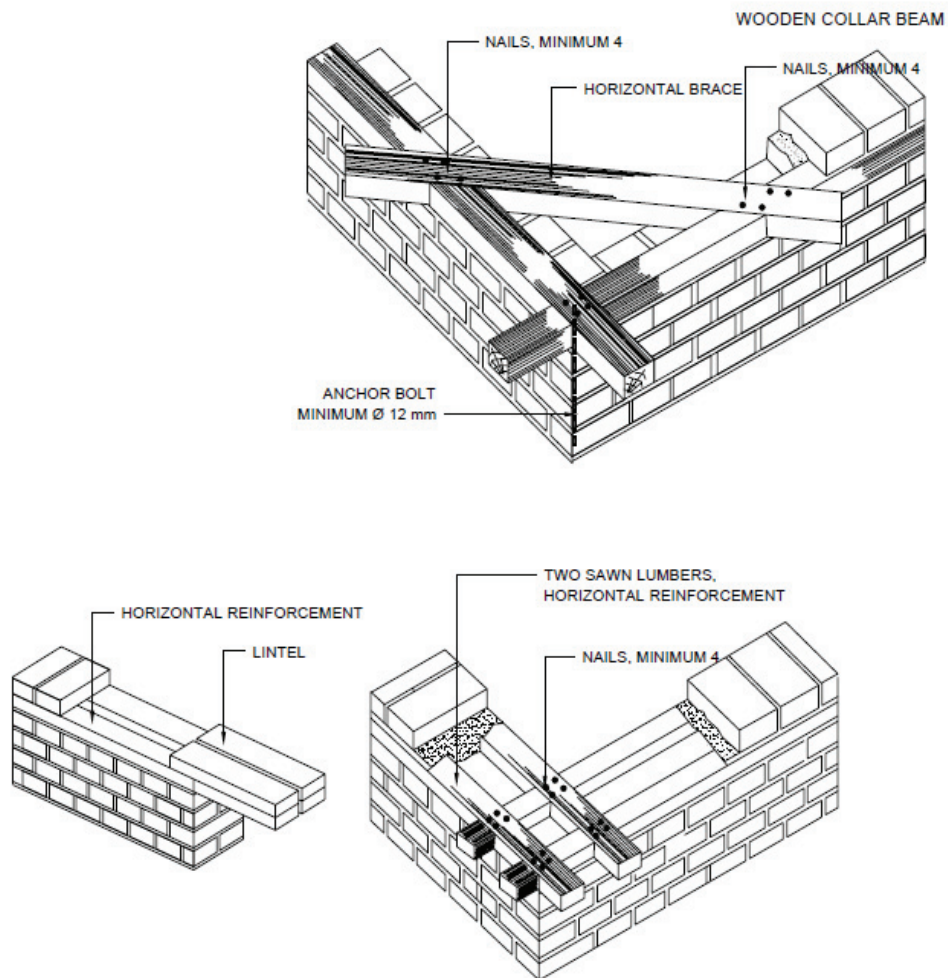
Placement of timber for horizontal reinforcement bands (*after* National Building Code: NBC203)
